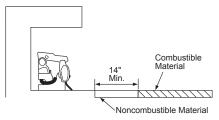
Minimum Fireplace Clearances If Installed at Floor Level
